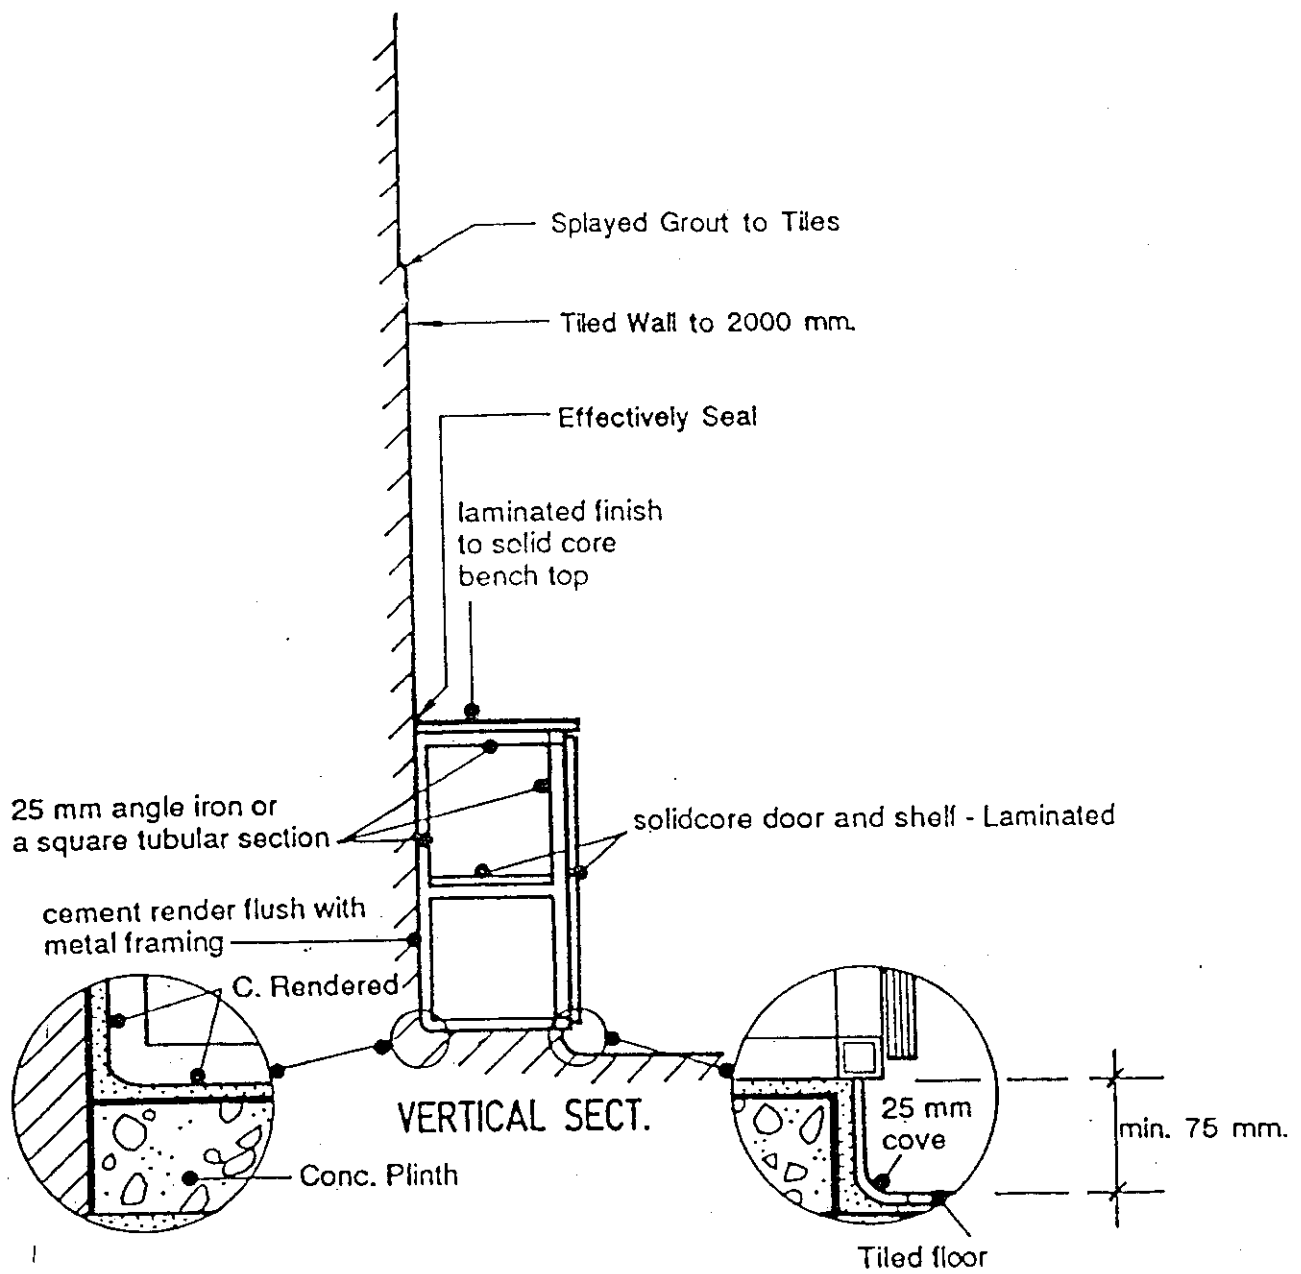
Typical Arrangement - Wall Cupboard (On Plinth)
